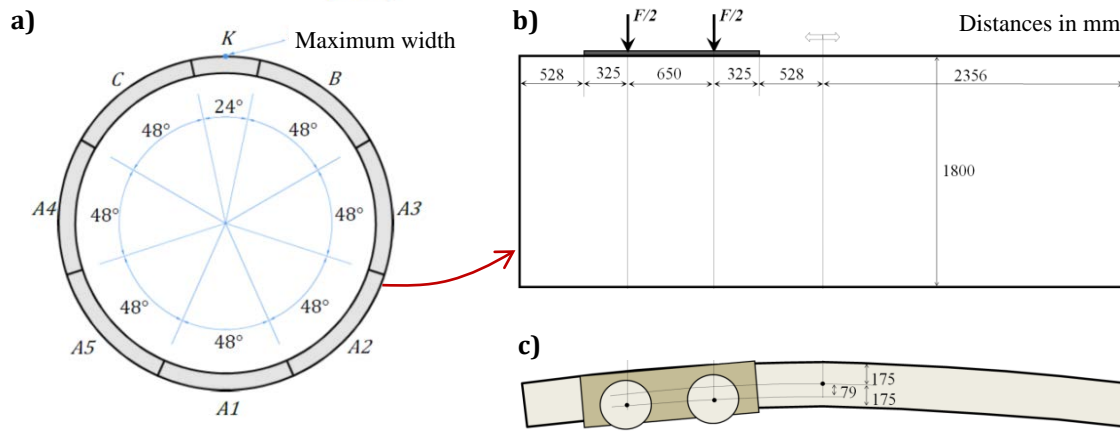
a) Detail of ring front view, b) top view and c) load application in the segment
